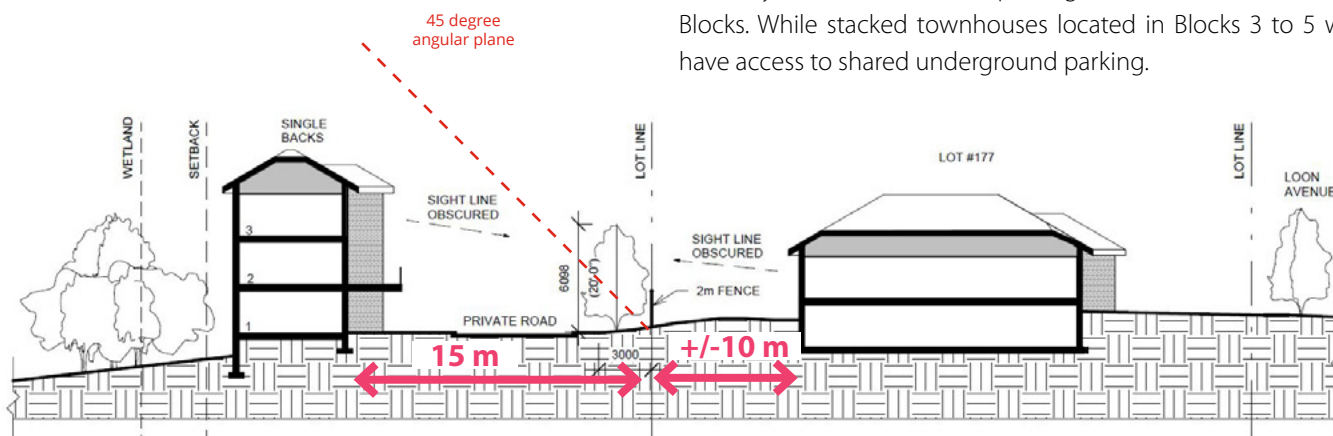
Conceptual cross section between proposed cluster townhouses and existing dwellings to the north.
